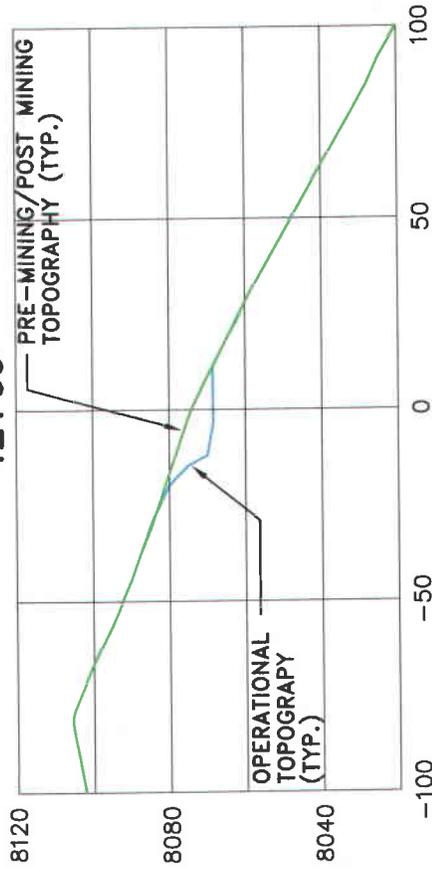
D. ROAD CROSS-SECTIONS FOR G-22
